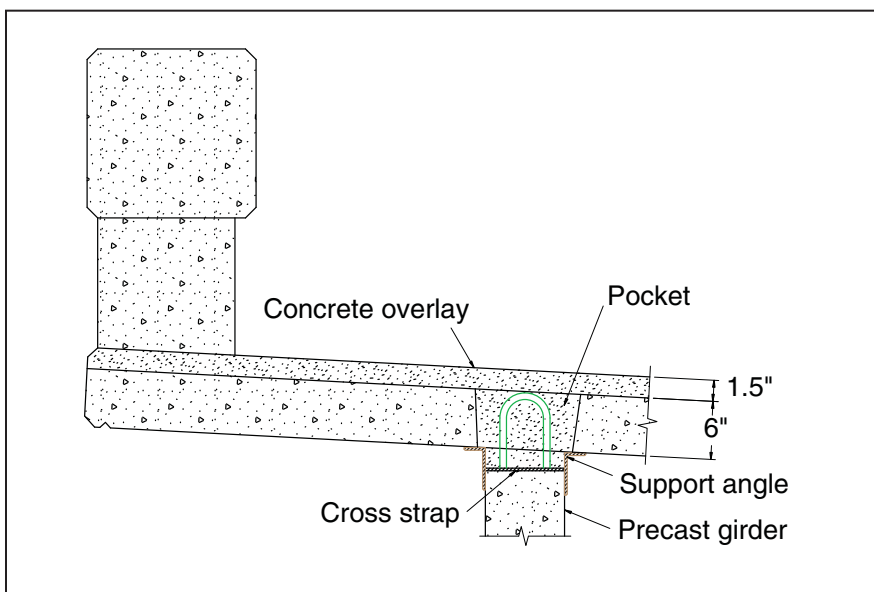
Connection details between the precast concrete deck panel and the girder.
